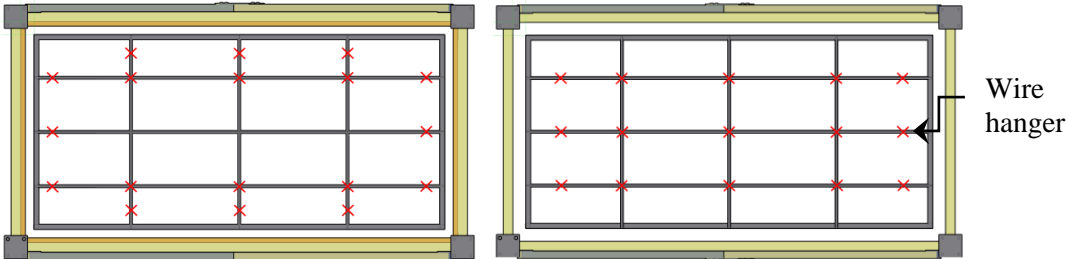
Ceiling specimen with hanger (a) layout A (left) and (b) layout B (right)
